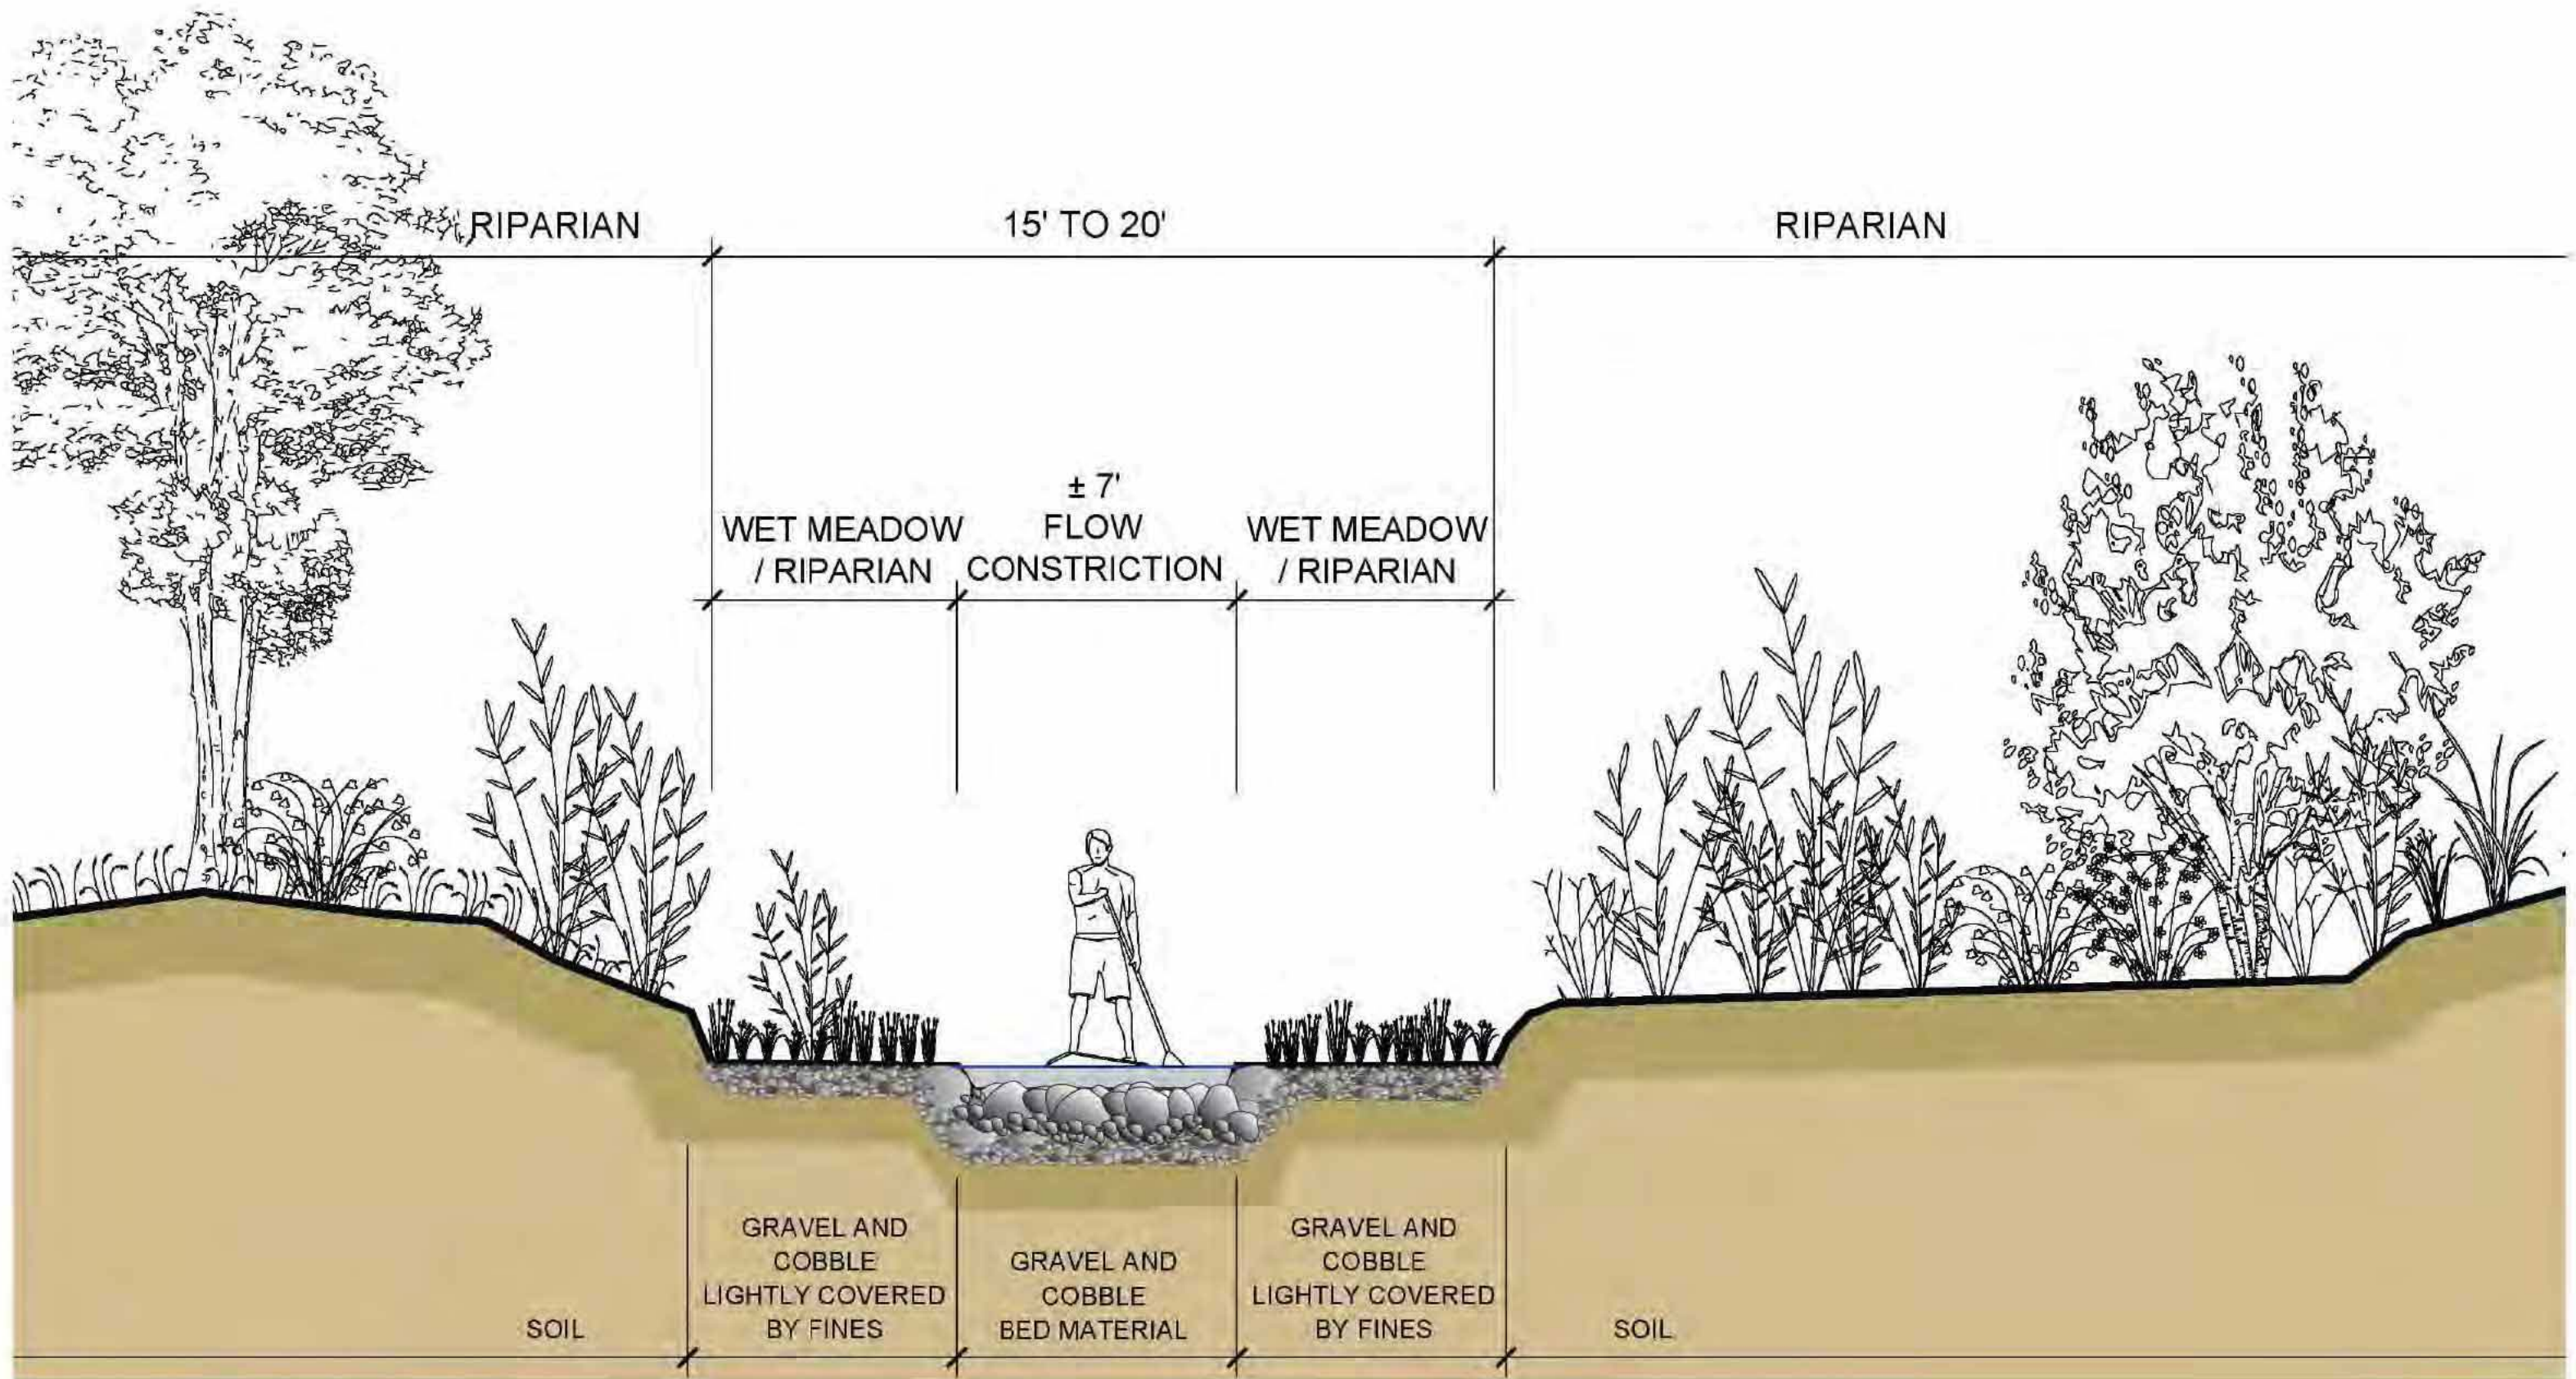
Typical cross-section view of the shallow flowing channel at a flow constriction.
